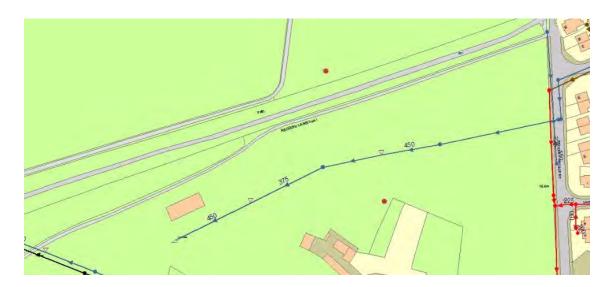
Surface water drain crossing the site shown as blue line. Existing foul sewer shown as red line – source United Utilities searches.
